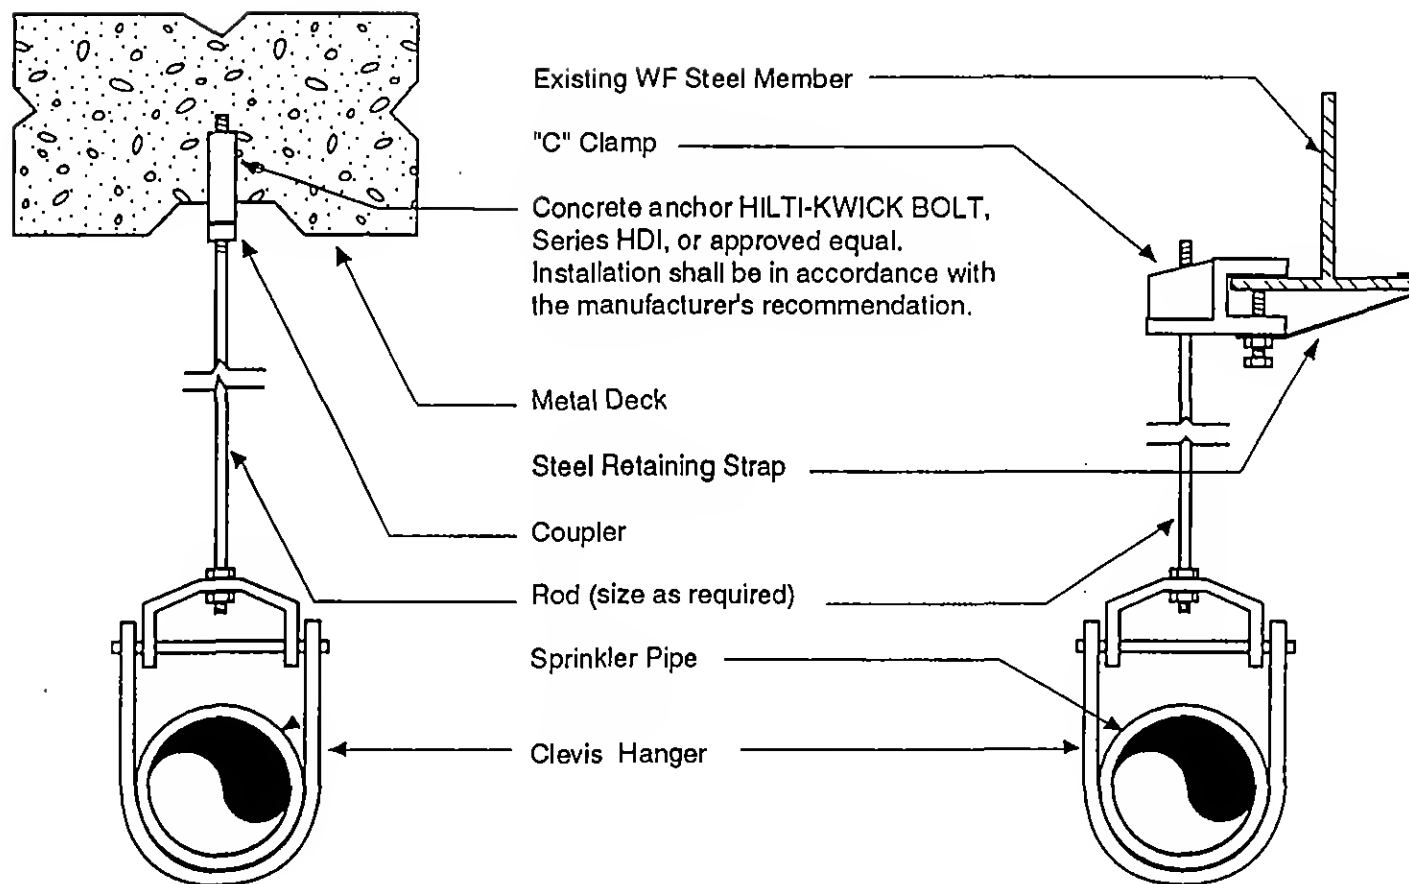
DETAIL OF TYPICAL PIPING CONNECTION TO SPRINKLER Not to Scale
